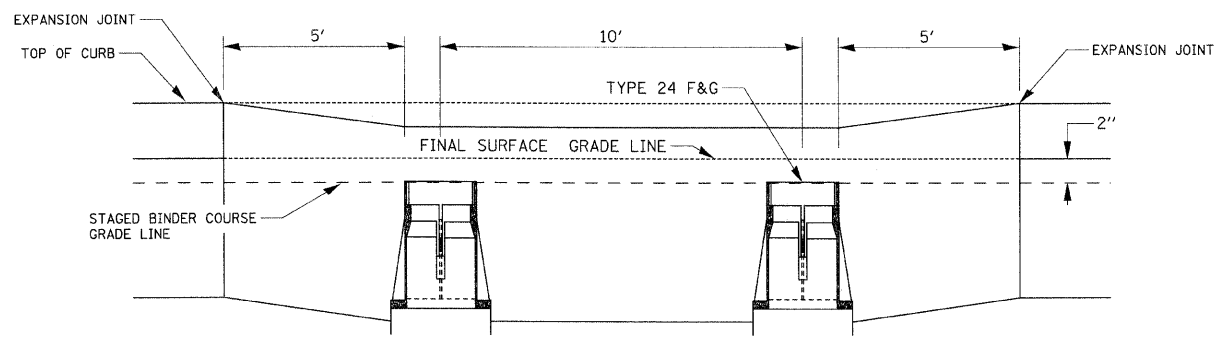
DETAILS FOR FRAME AND LID ADJUSTMENT IN PAVEMENT
